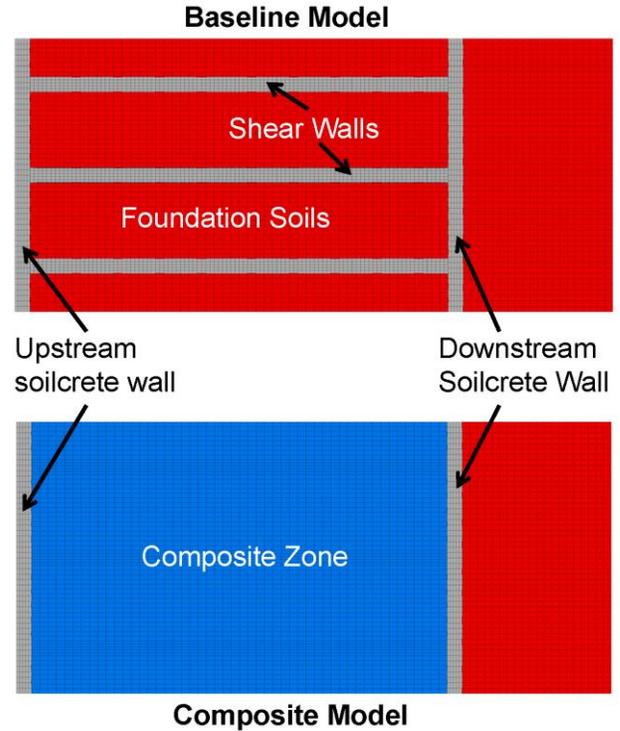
Plan view of the layout of the ground improvements versus the layout of the composite layout.
